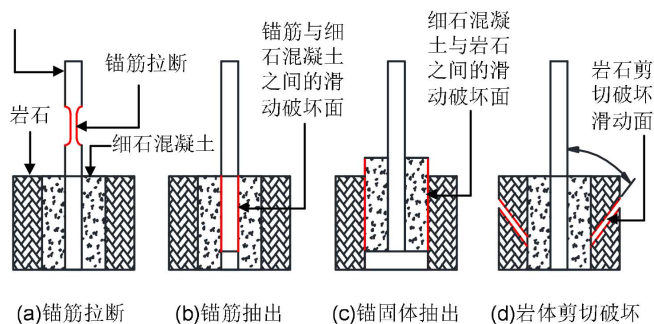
Possible failure modes of rock anchor foundations
